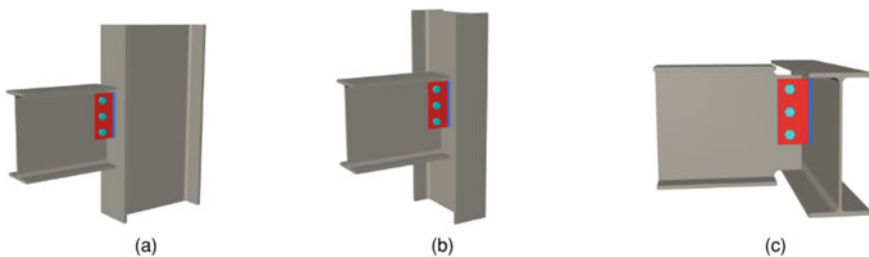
Selected connection configurations: a Beam-to-column-flange connection, b Beam-to-column-web connection, c Beam-to-girder connection
